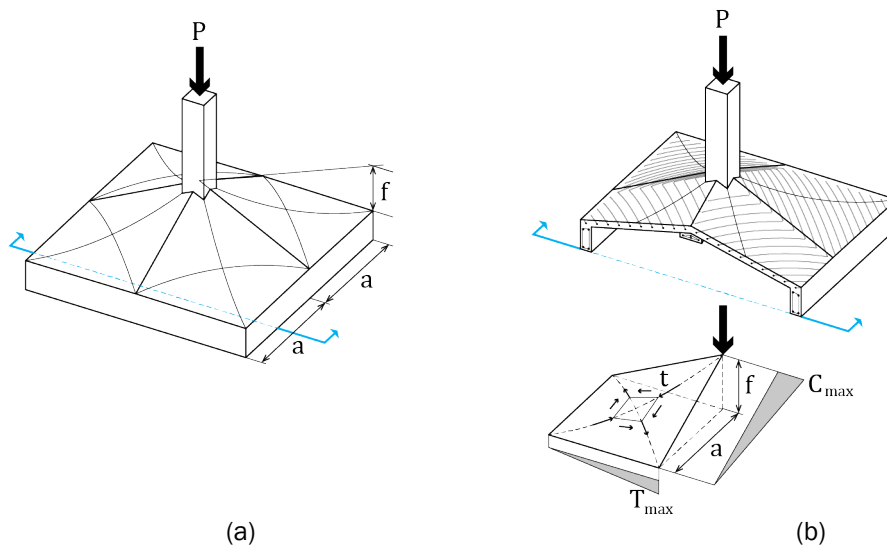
(a) Dimensions of shell footing, and (b) section of shell footing with forces
